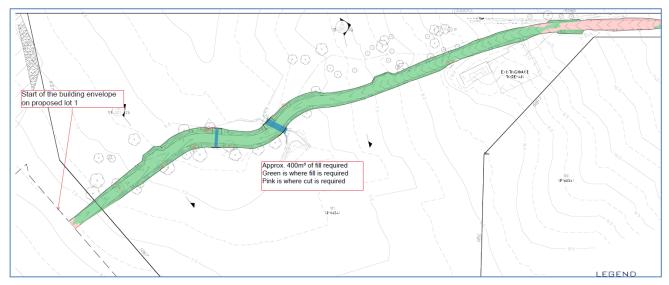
Cut and fill plan. Green is fill and pink is cut
